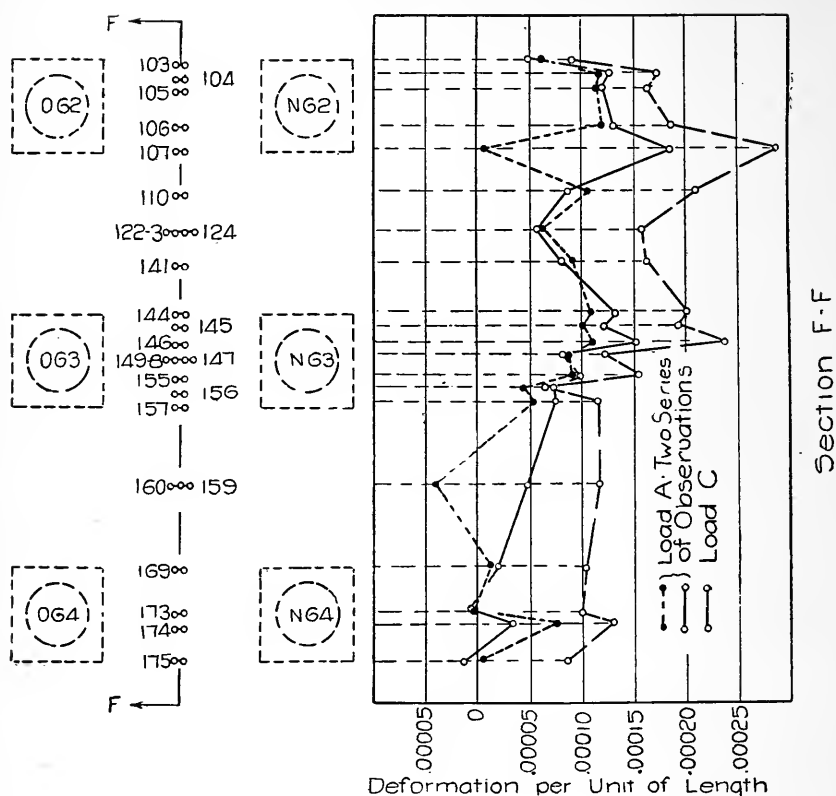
EFFECT OF CHANGE FROM LOAD A TO LOAD C ON DEFORMATION IN GAGE LINES CROSSING SECTION F-F ON TOP OF S00 TERMINAL TEST FLOOR.
